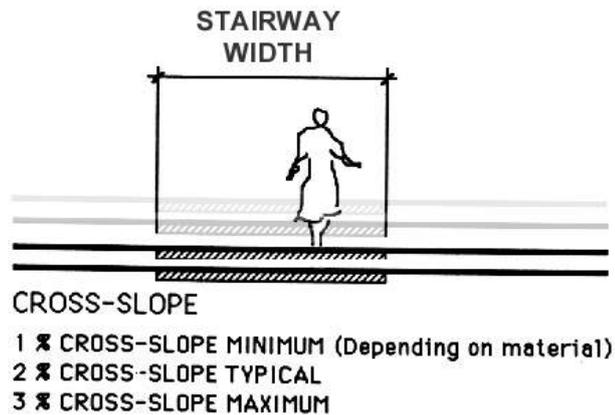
26: stairway slope criteria for drainage (Source: Mannes 1986)
